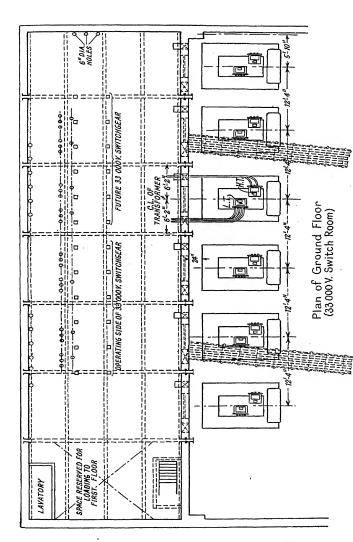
LAYOUT OF A LARGE STATIC SUB-STATION
